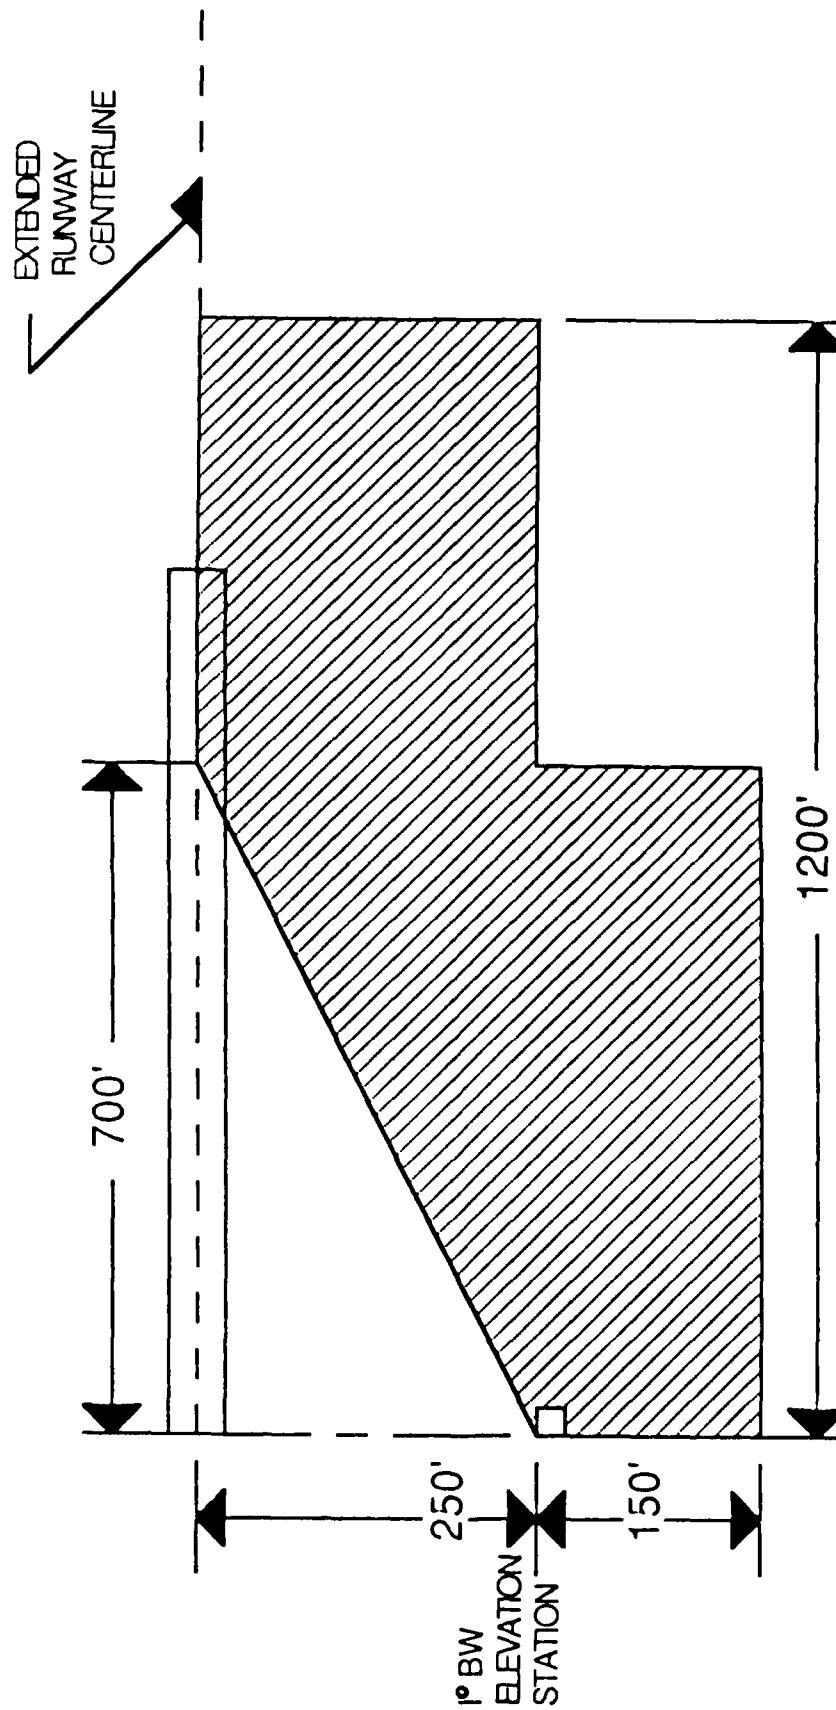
Elevation Site Critical Area for a 1° Beamwidth Antenna (Plan View).
